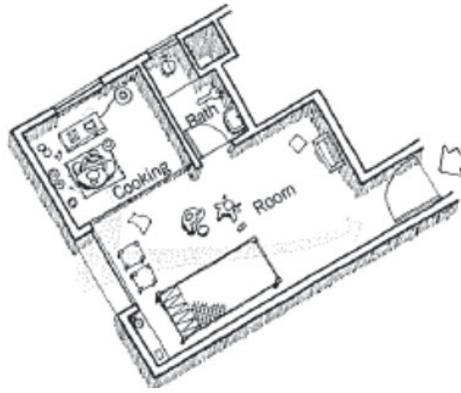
Floor plan and typical unit of MHADA housing (1999)
